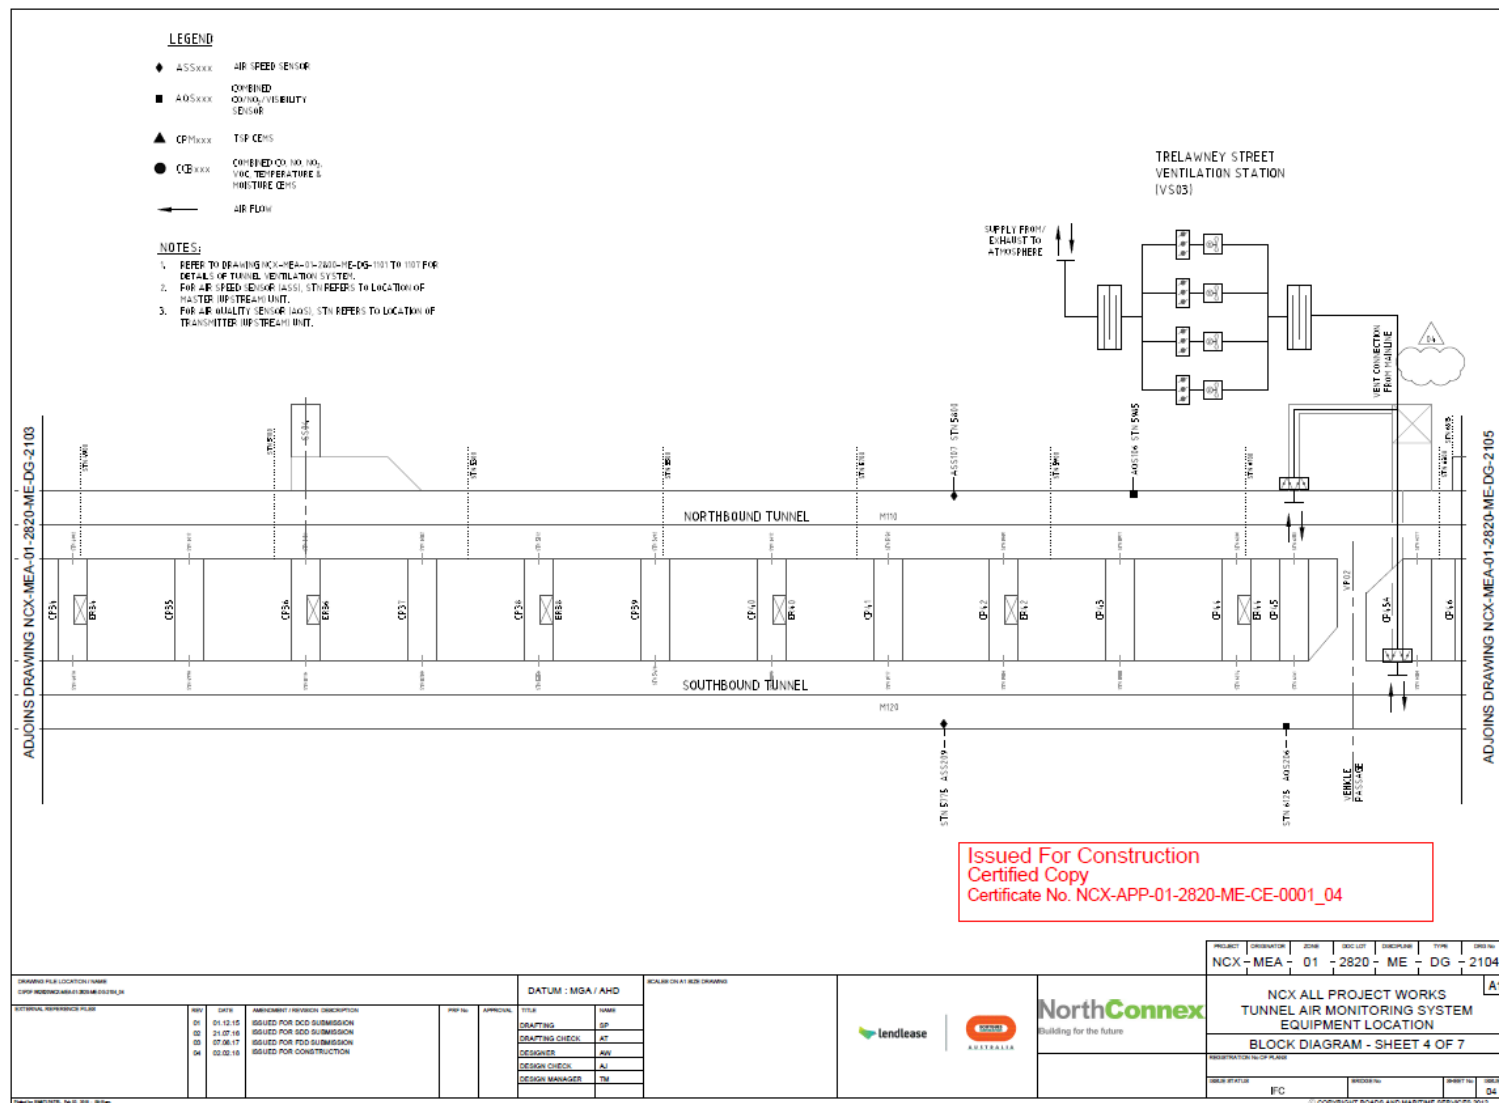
In-tunnel air monitoring locations – Sheet 4 (AQ5106, AQ5206)
